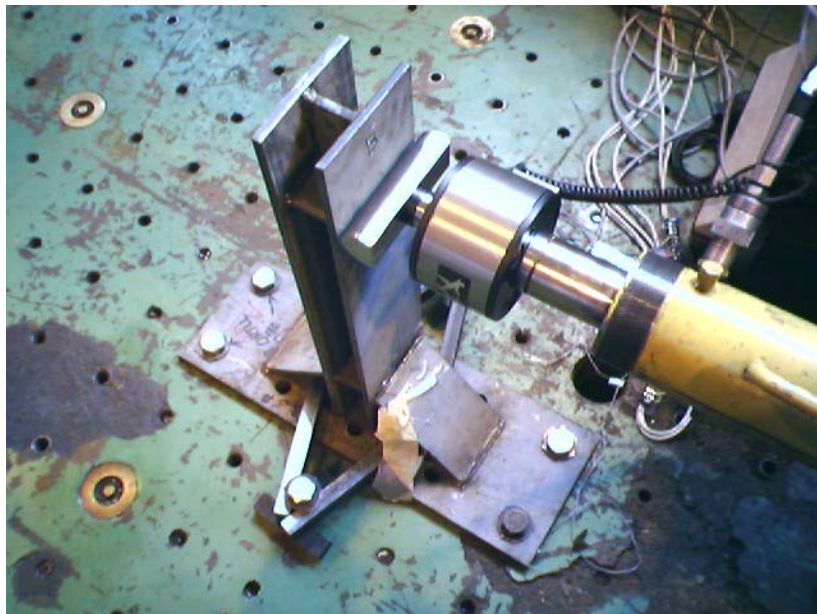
Test arrangement in laboratory showing test specimen and hydraulic actuator
